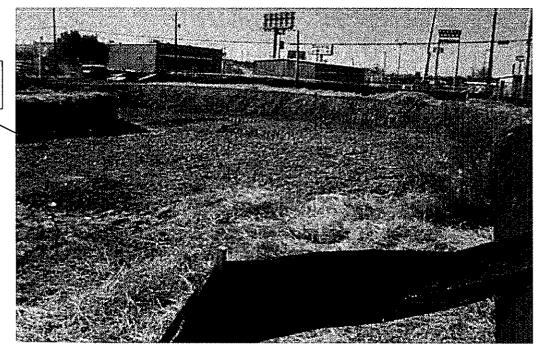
Phase I pre-construction – Headworks Building excavation and post-excavation sampling grid.
